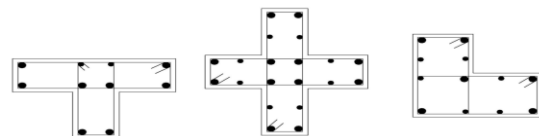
Special shaped (T,+L) columns with longitudinal and shear reinforcement
